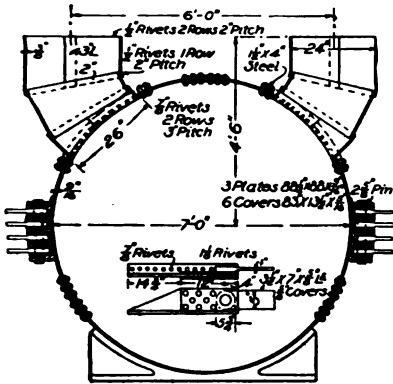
Anchor Connections. End of Penstock. Plant of Niagara Falls Hydraulic Power & Manufacturing Company.
